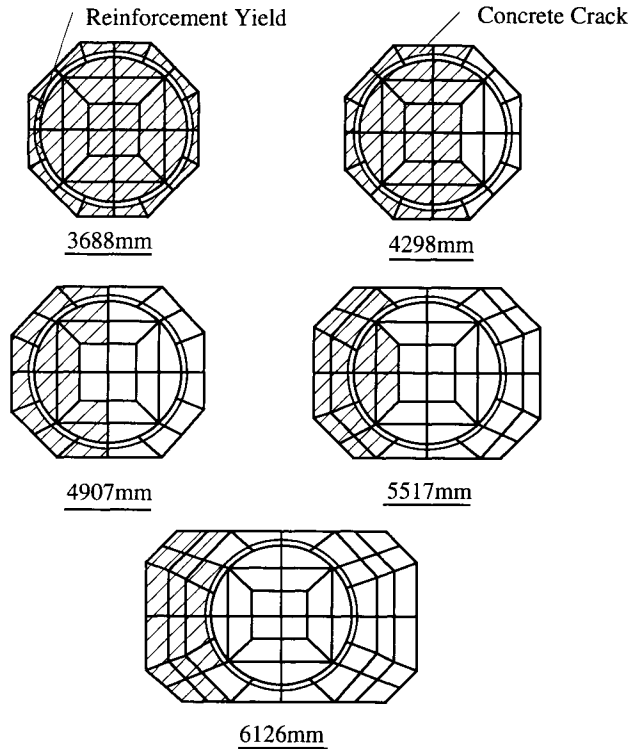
Crack pattern of column R4L under lateral load in strong axis
